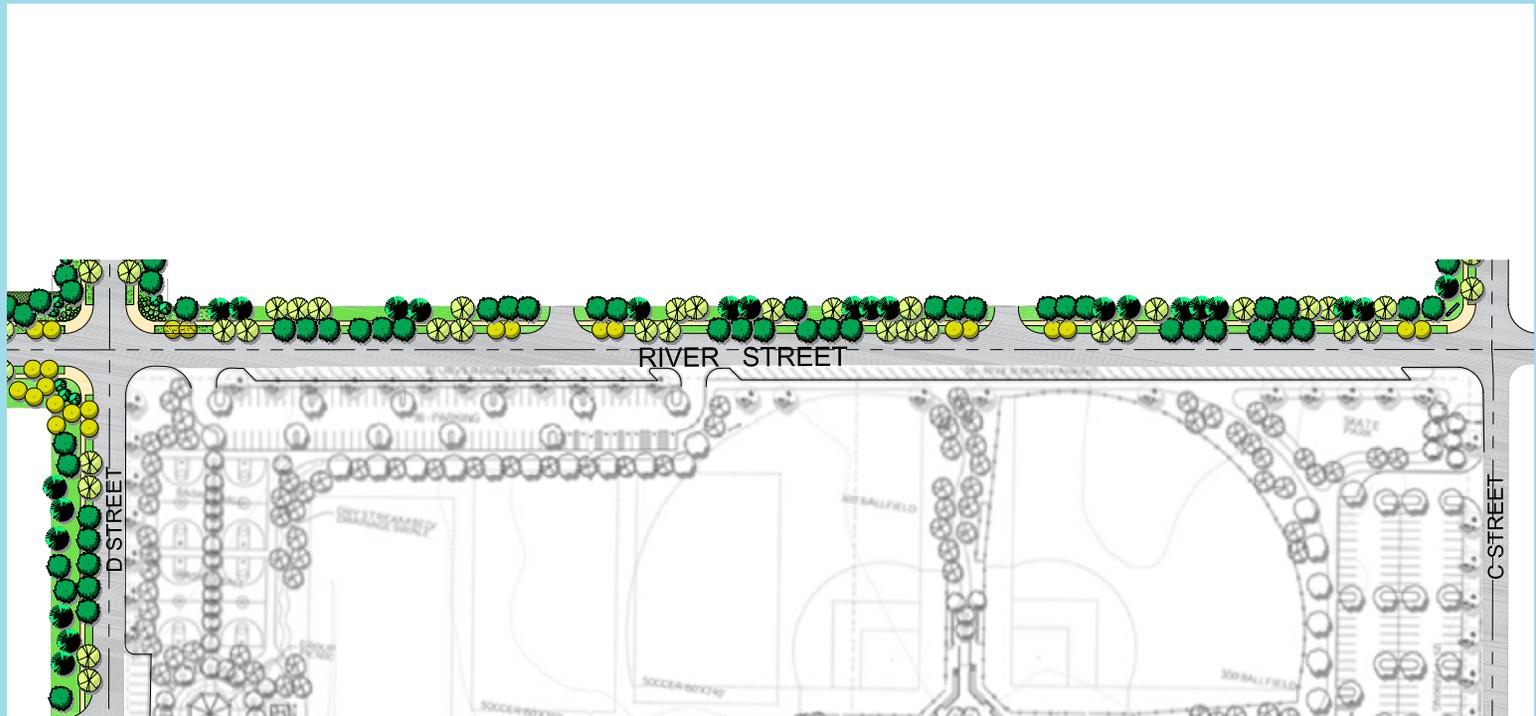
PLAN VIEW OF STREETSCAPE ALONG RIVER STREET BETWEEN C STREET AND D STREET
